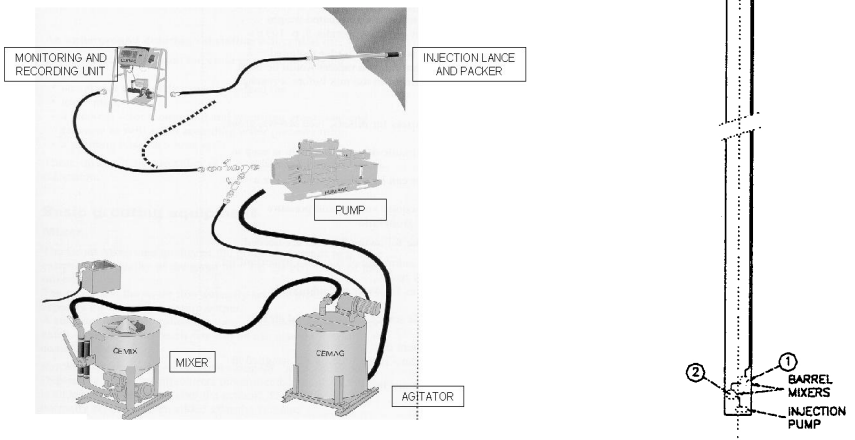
Elements of the injection equipment and suggested location in shaft sinking operations.
